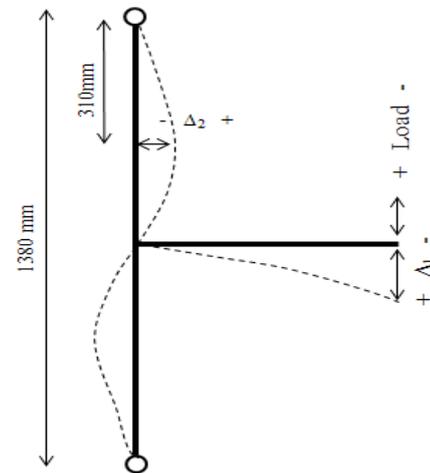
Instrumentation position details and projected distorted geometry (down loading).
